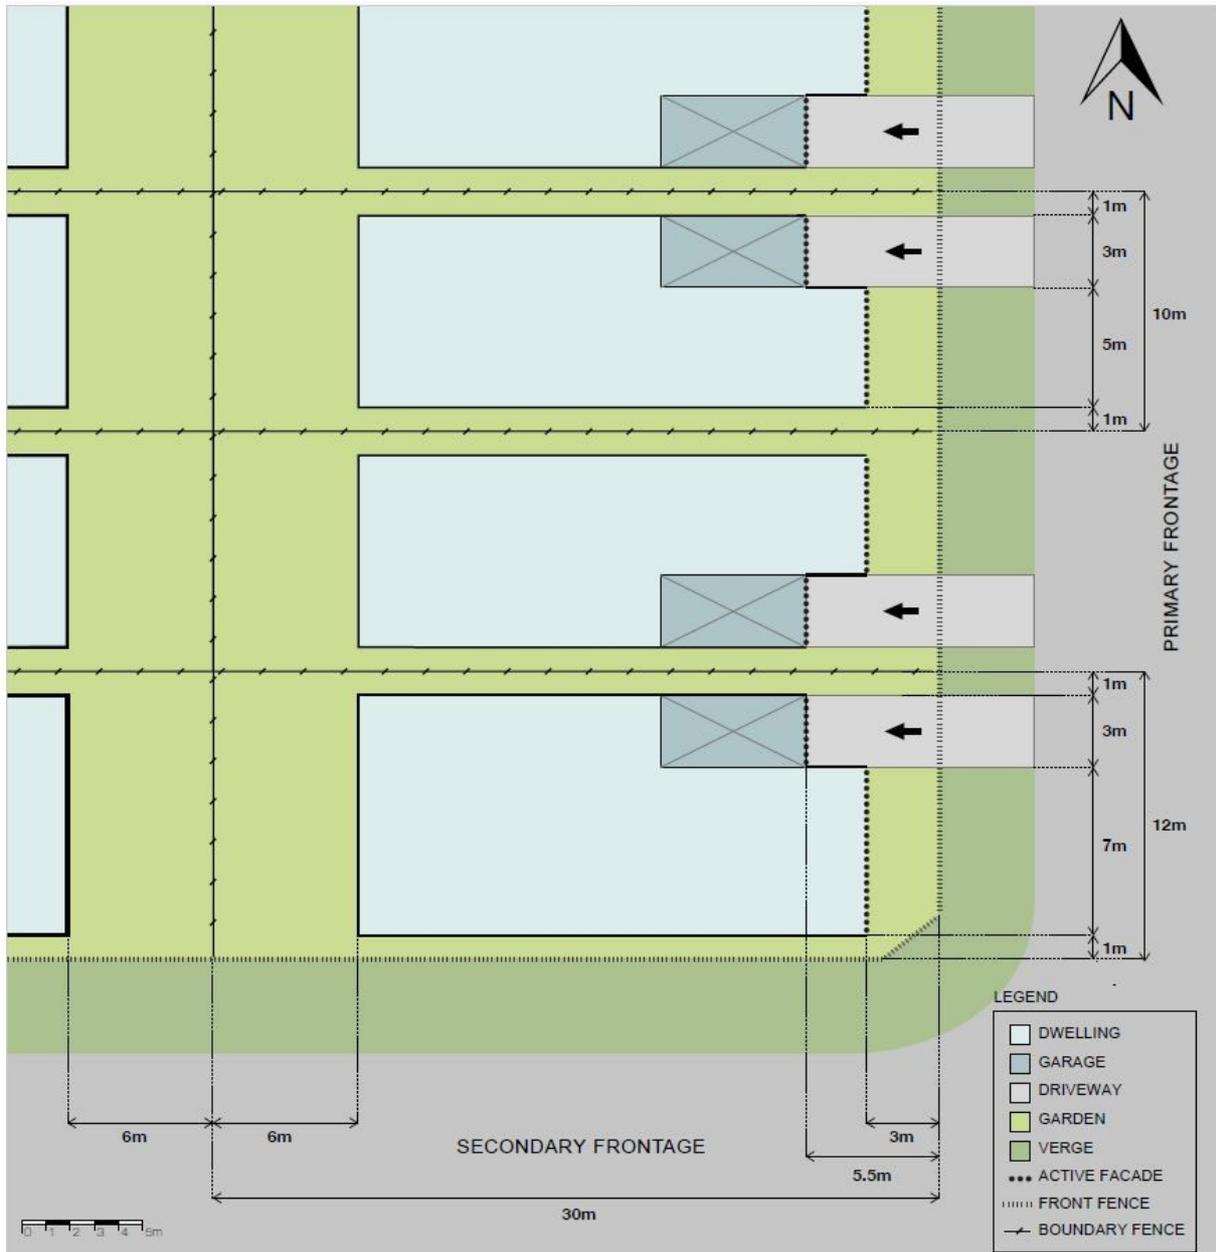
Example lot and dwelling layout of dwellings within Precinct A designed in accordance with the acceptable solutions under clauses BRI-S9.7.2.1, BRI-S9.7.2.3, BRI-S9.8.1 and BRI-S9.8.6.1, where access is from the secondary frontage and the lot frontage is between 30 degrees east and west of north.
